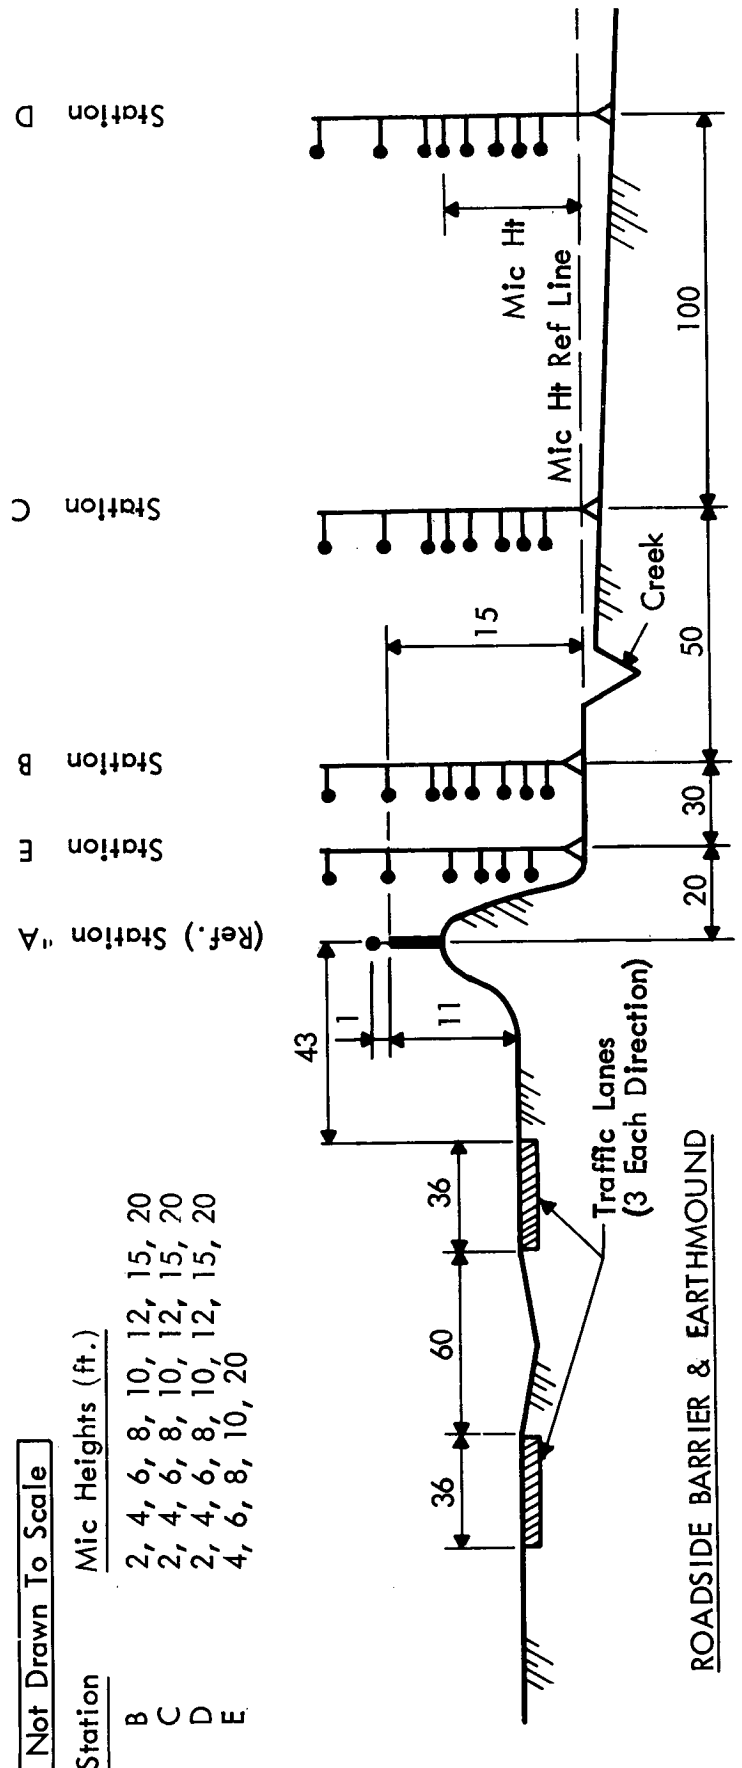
Site cross-section and acoustic measurement stations, Site 1.
